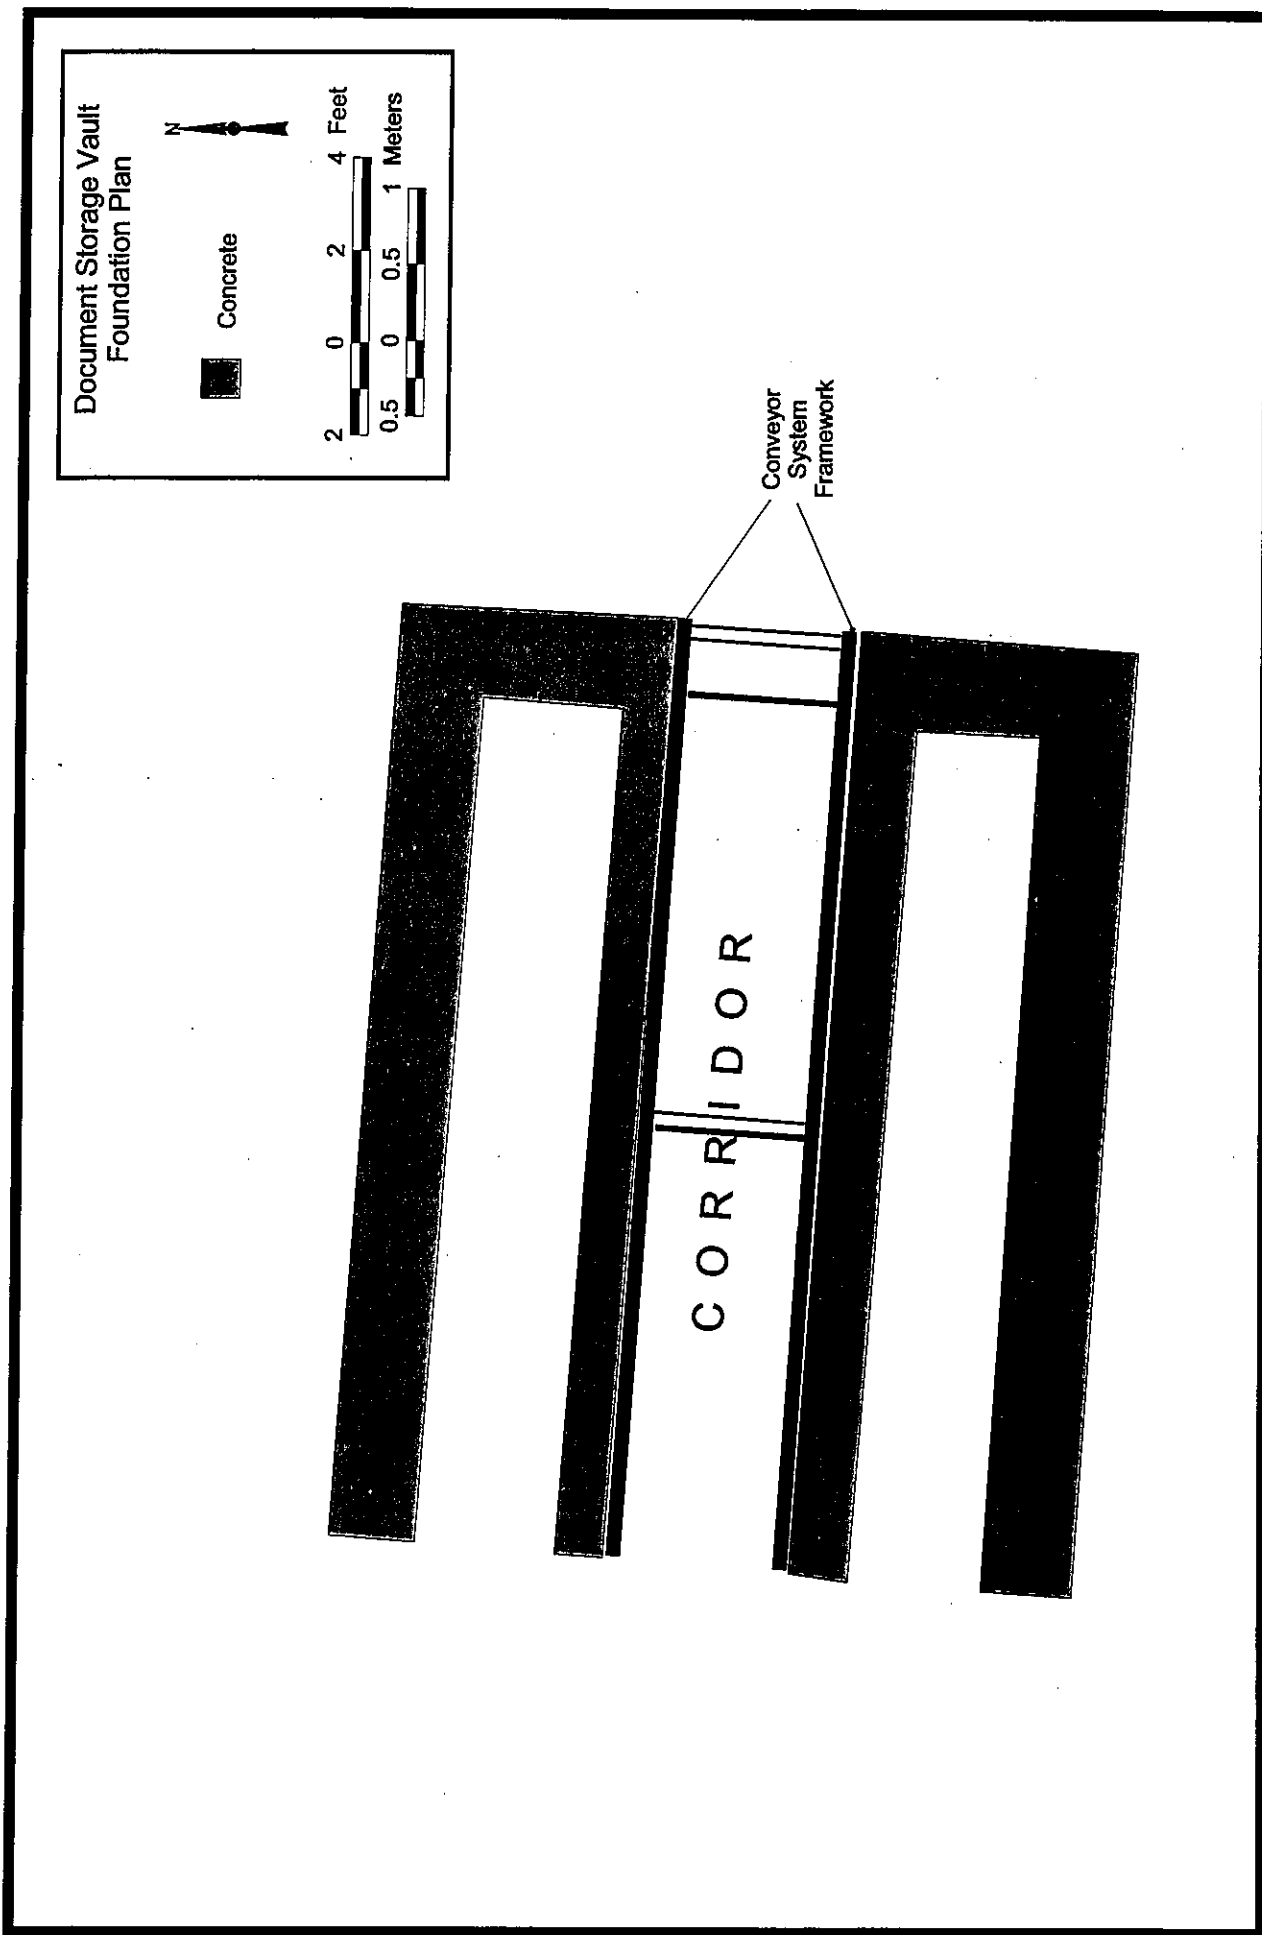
Plan view drawing of the Document Storage Vault foundation showing conveyor frame running through the length of the foundation.
